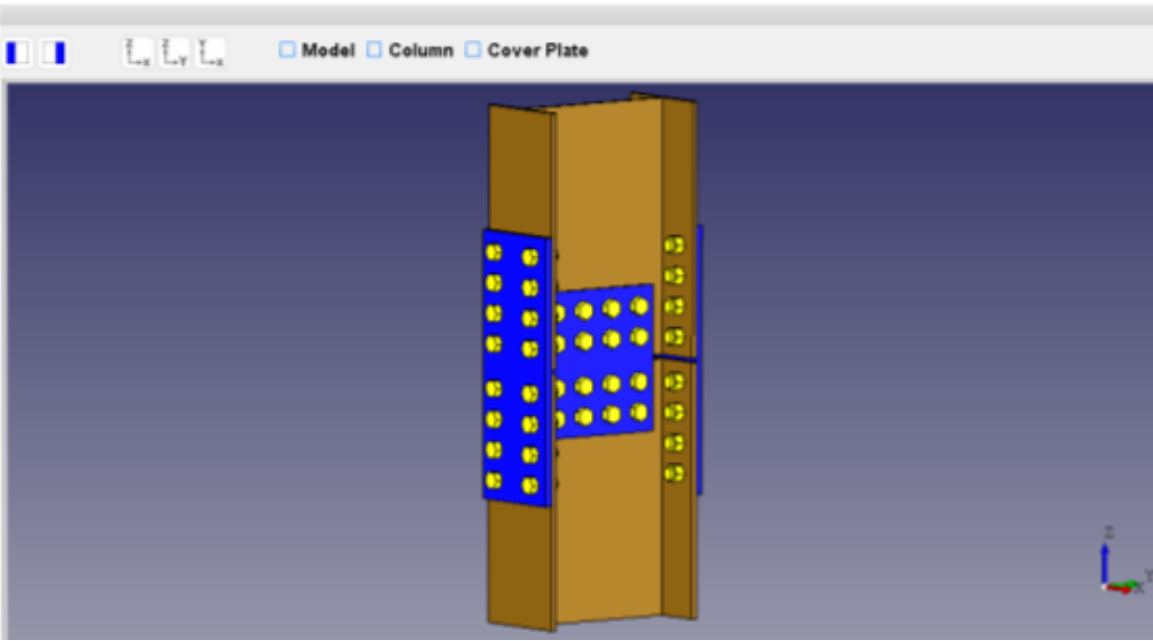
3D drawing output of typical Column-Column Cover Plate Bolted connection
